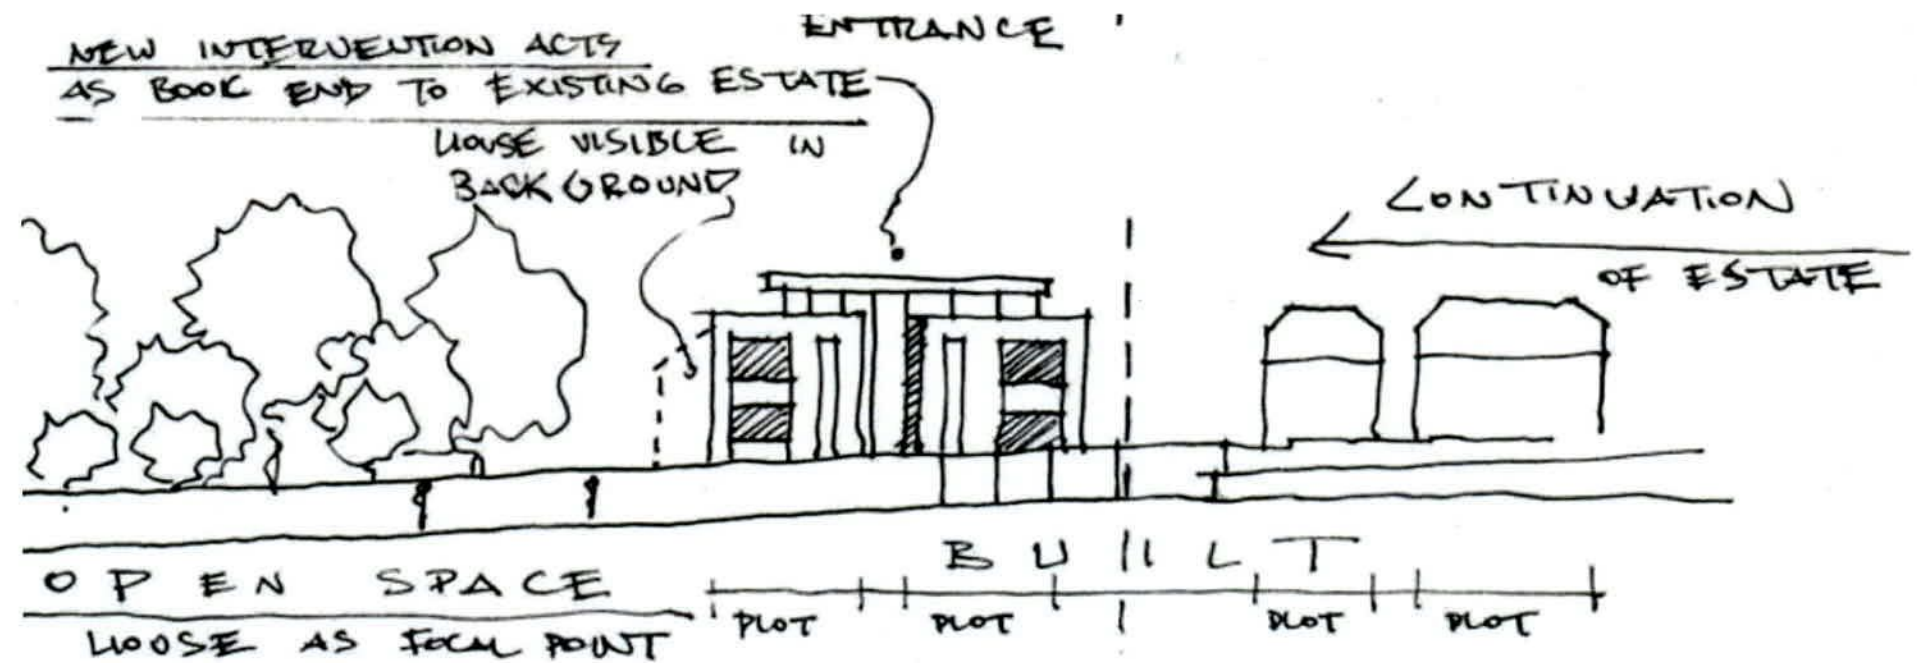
IMAGE : Diagrammatic Section - Relationship between New Block, Prospect House and Stocking Lane
